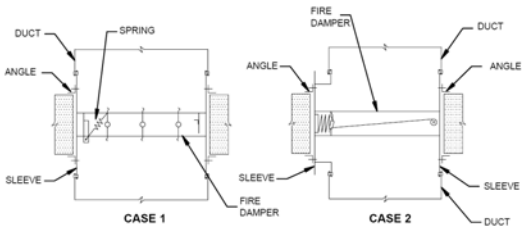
FIRE DAMPER OUT OF WALL
